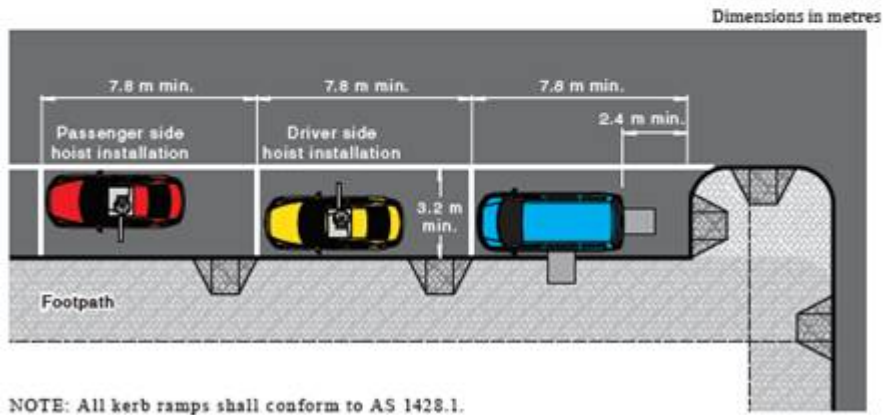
Examples of accessible parallel parking with kerb extensions
